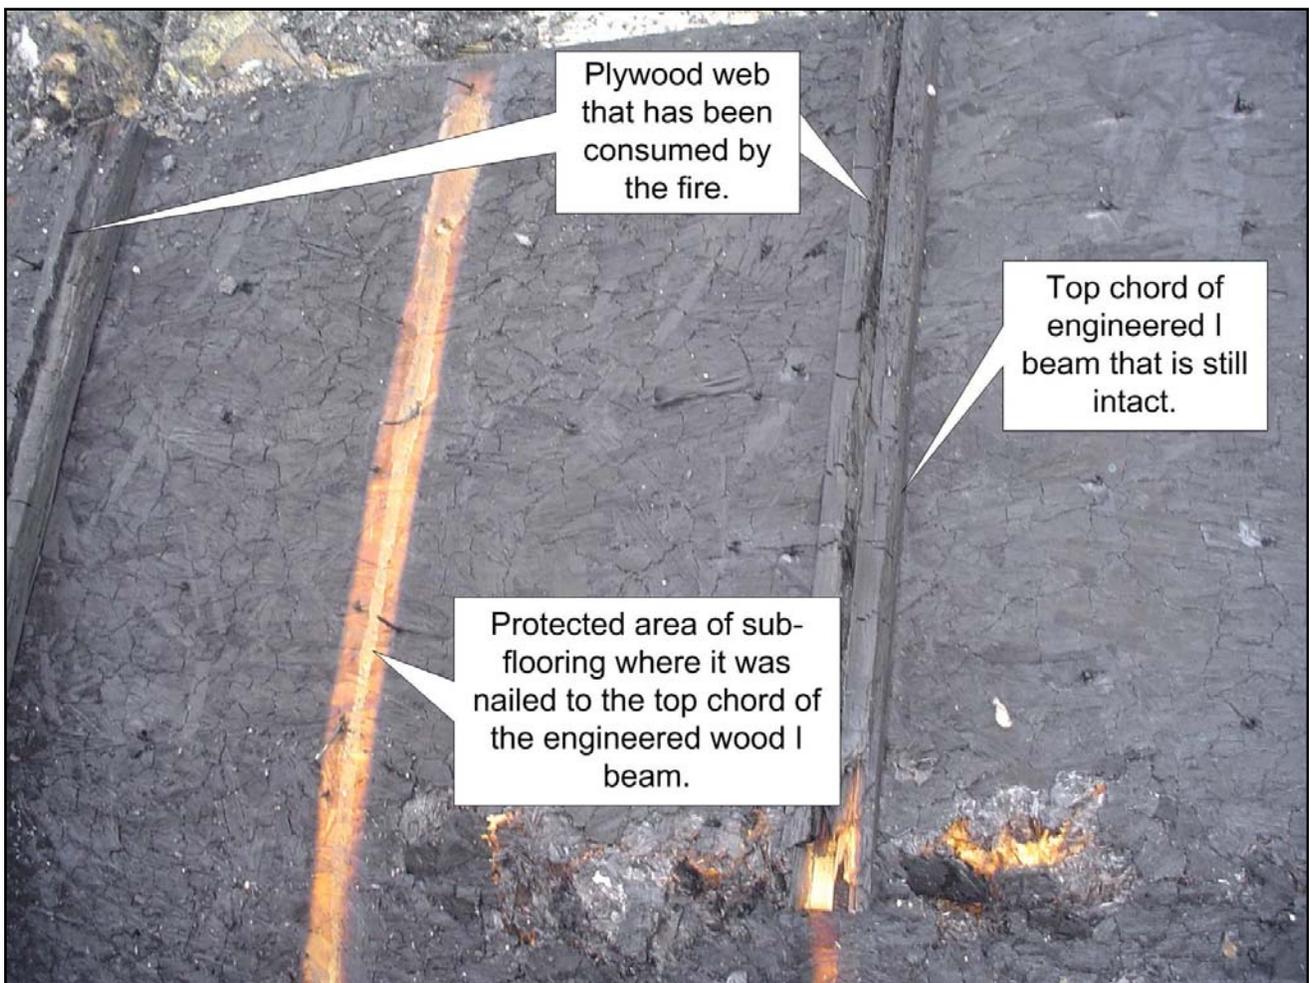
Engineered Wood I-Beam Webs Consumed by Fire
